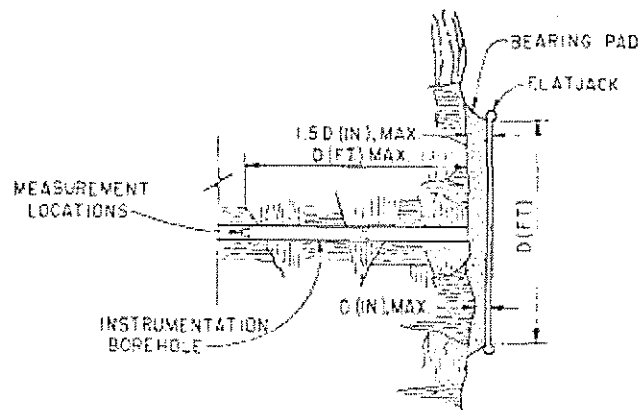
Allowable Dimensions for Rock Surface and Bearing Pad, Flexible Plate Loading Test
